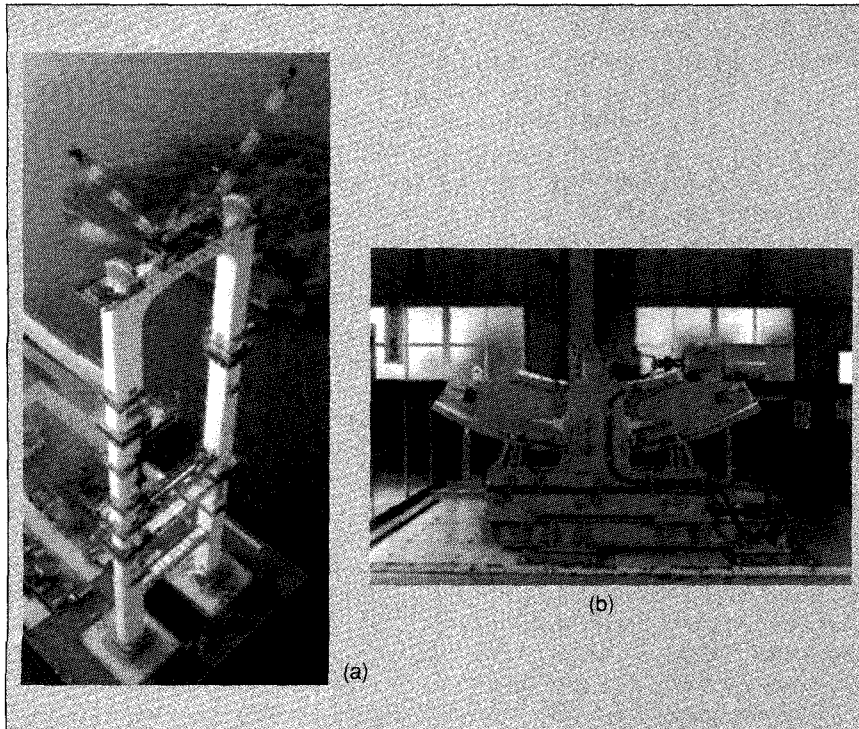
Rainbow Bridge Tower while under construction. Fig. 4b. HMD employed during tower erection.
